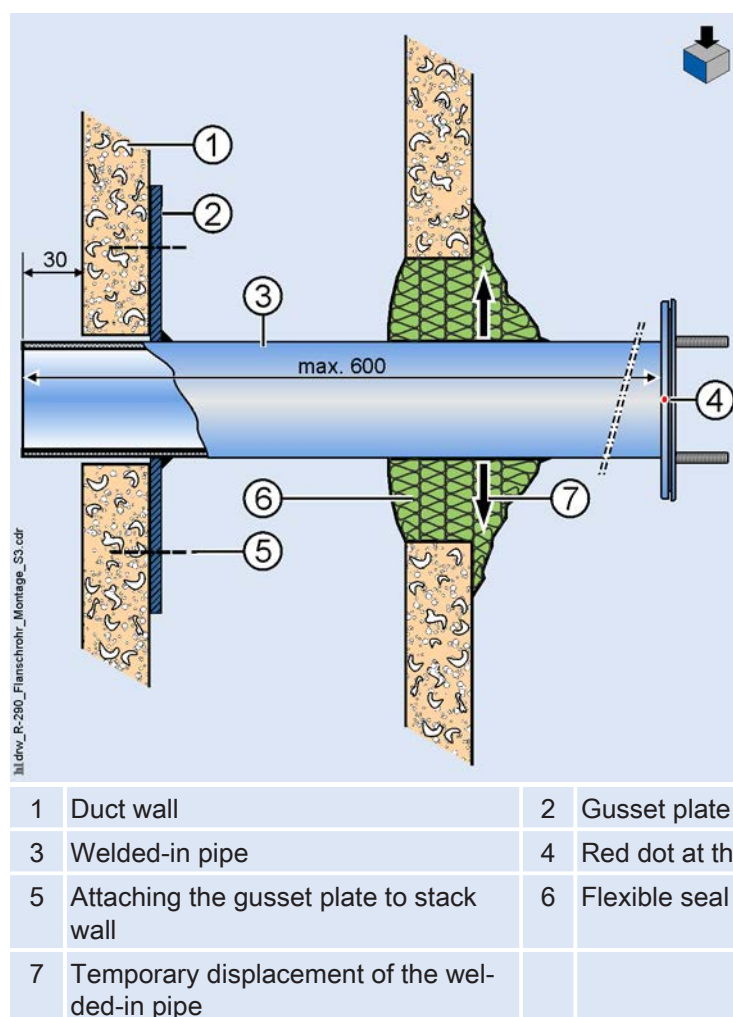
Installation of a welded-in pipe with adjustment flange in a double-walled flue
